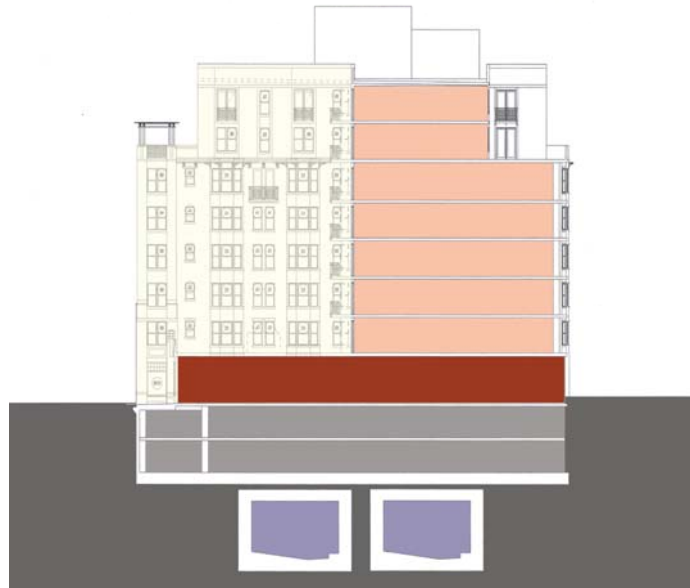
Ellington – Section showing the relationship between the building and metro tunnels (Torti Gallas and Partners, Inc.)
